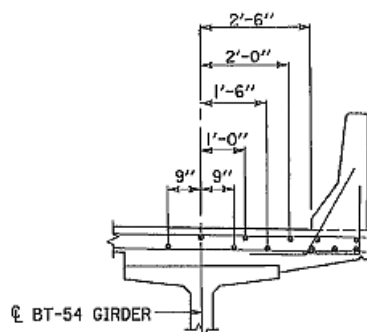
Deck Reinforcement Configuration near the Barriers
